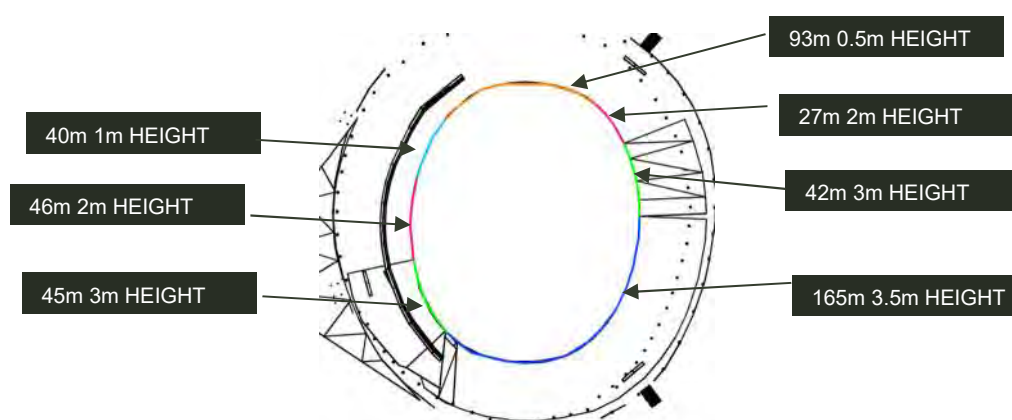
Macquarie Point – Extent of Pitch Perimeter Retaining Wall
